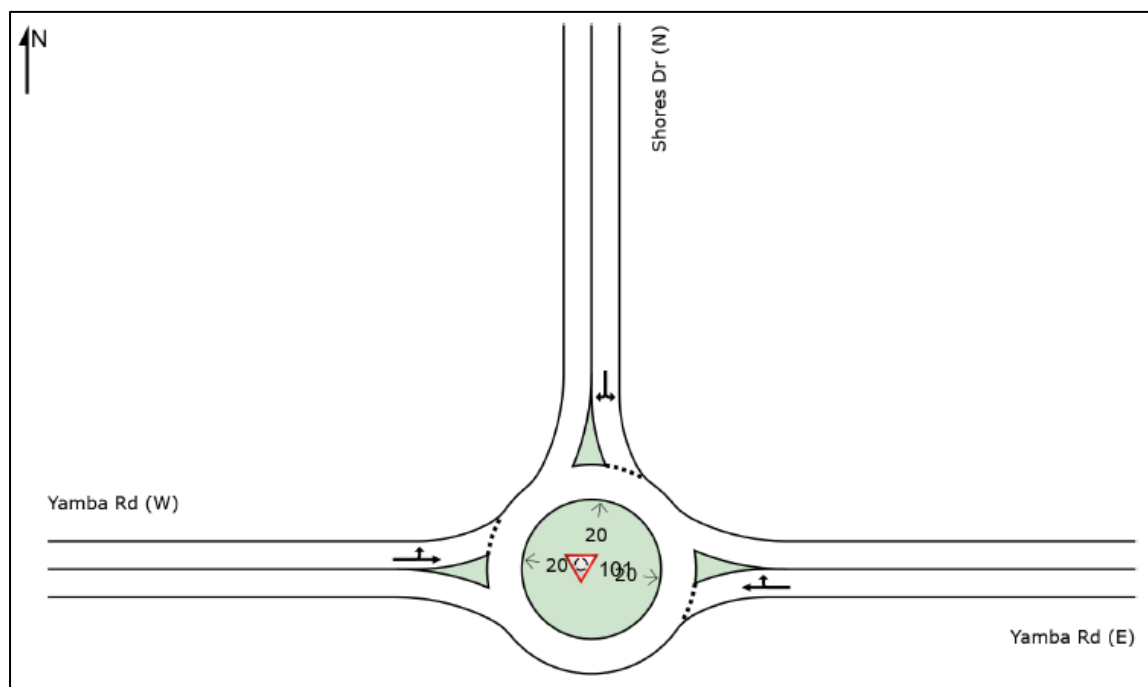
Yamba Road / Shores Drive SIDRA Intersection Layout
